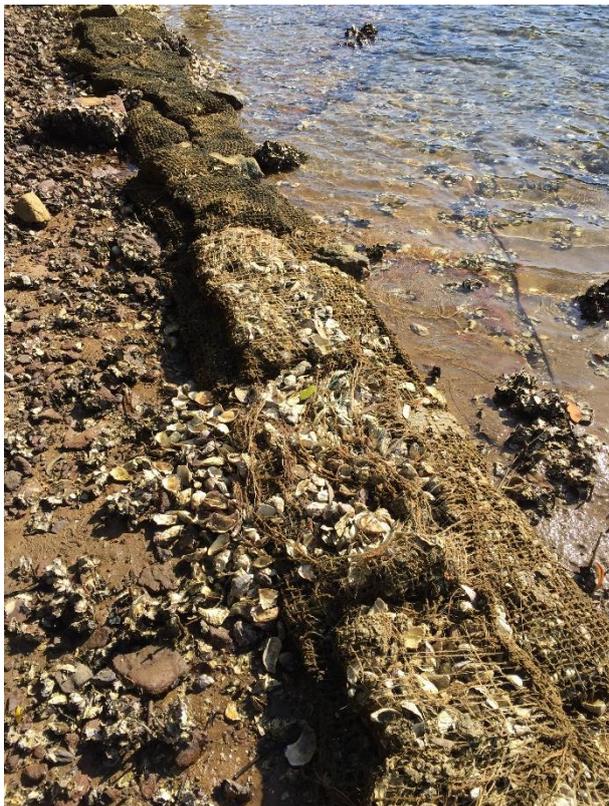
Photo of structures at HD Robb Site showing bag degradation - April 2018.
